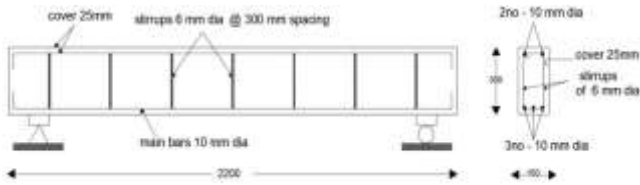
(e): reinforcement details for $\rho_t = 0.59\%$
